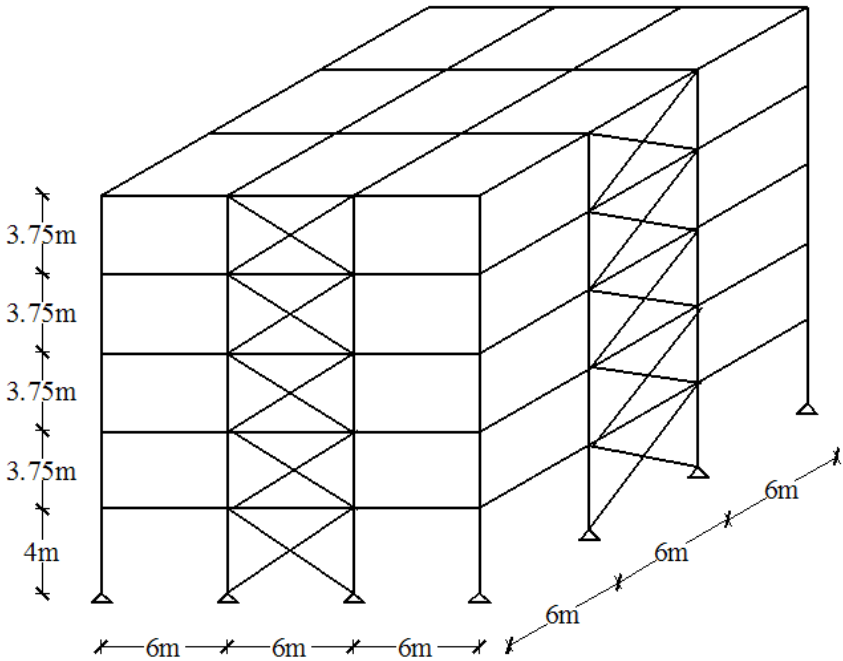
Symmetrical Plan and Section with central bays cross bracings.
